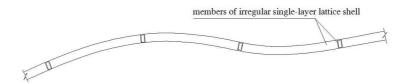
Schematic view of local section of irregular single-layer lattice shell.
